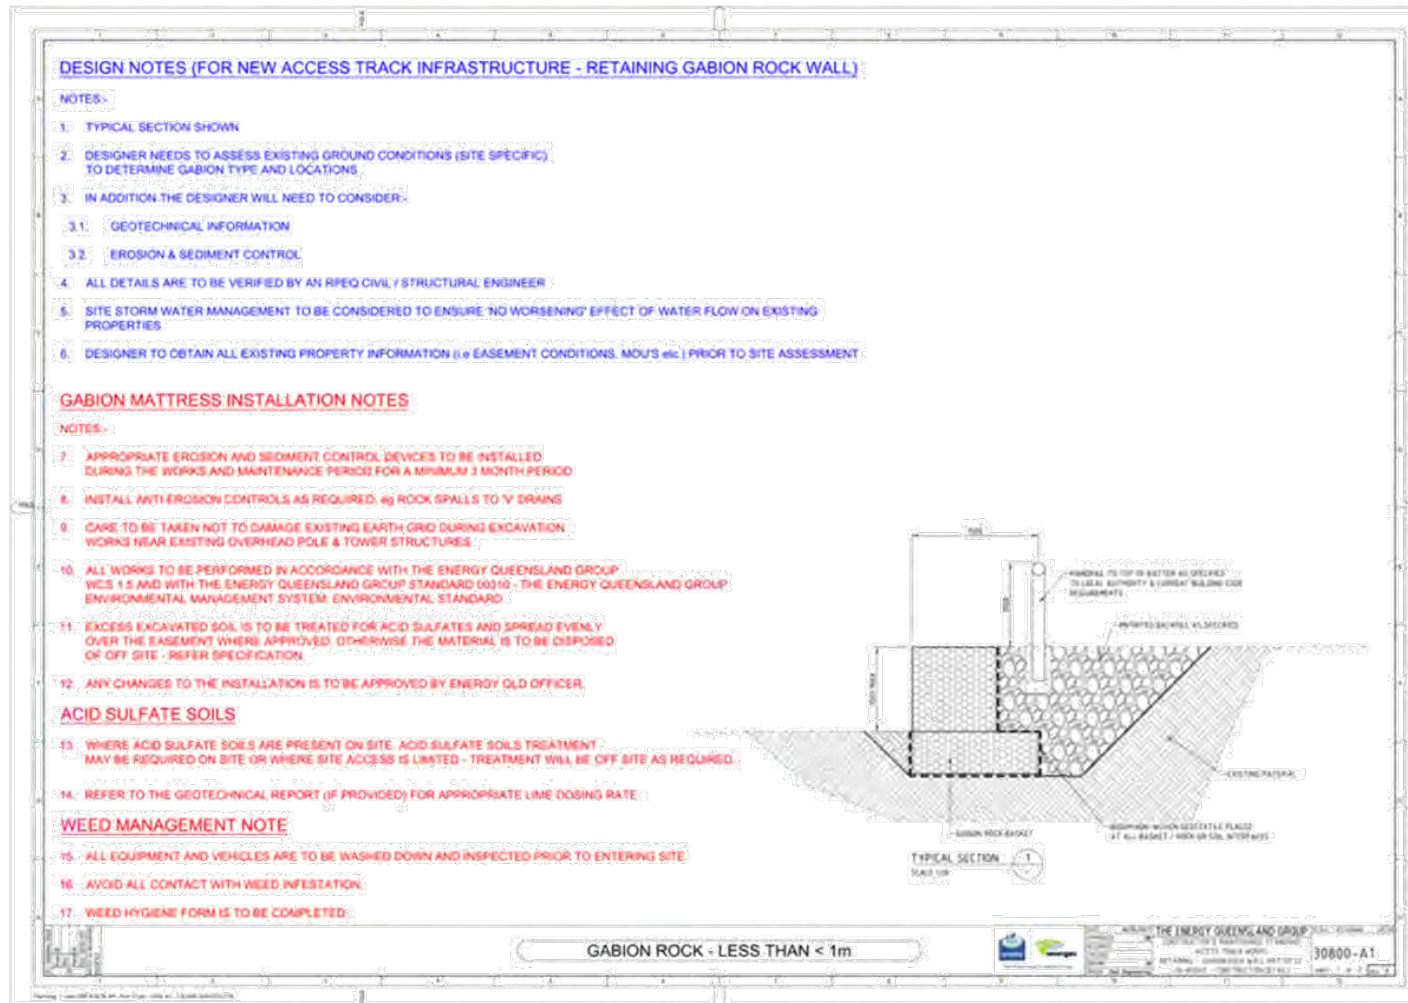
Access Track Infrastructure – Land Stabilisation – ≤1m Gabion Rock Wall Mattress Details.
